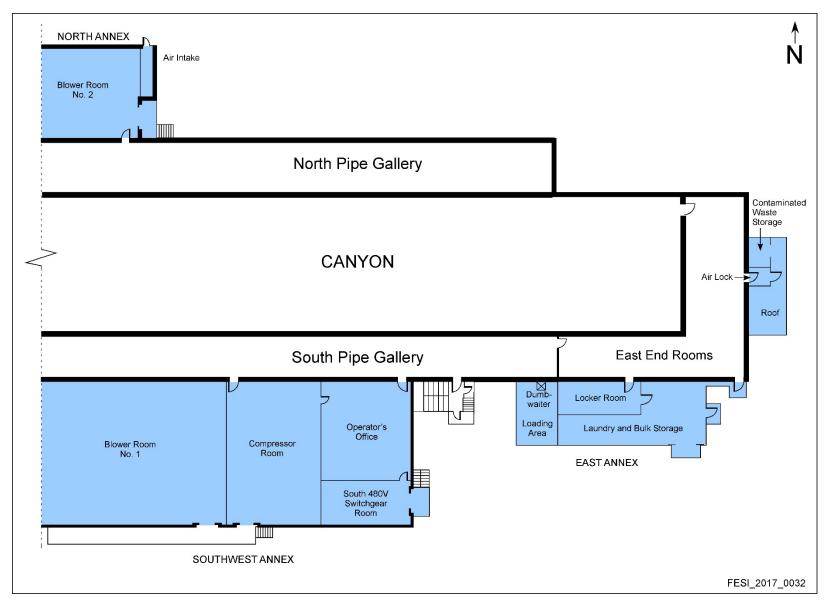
202S Annex Plan View at the Pipe Gallery Level – East End of Building
